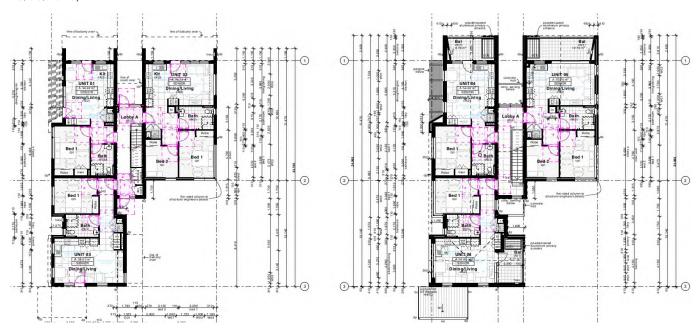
Extract from Architectural Plans – Ground & First Floor Plan (Block A) (Source: Architectural Plans, Stanton Dahl Architects, dated 23/06/2023)
